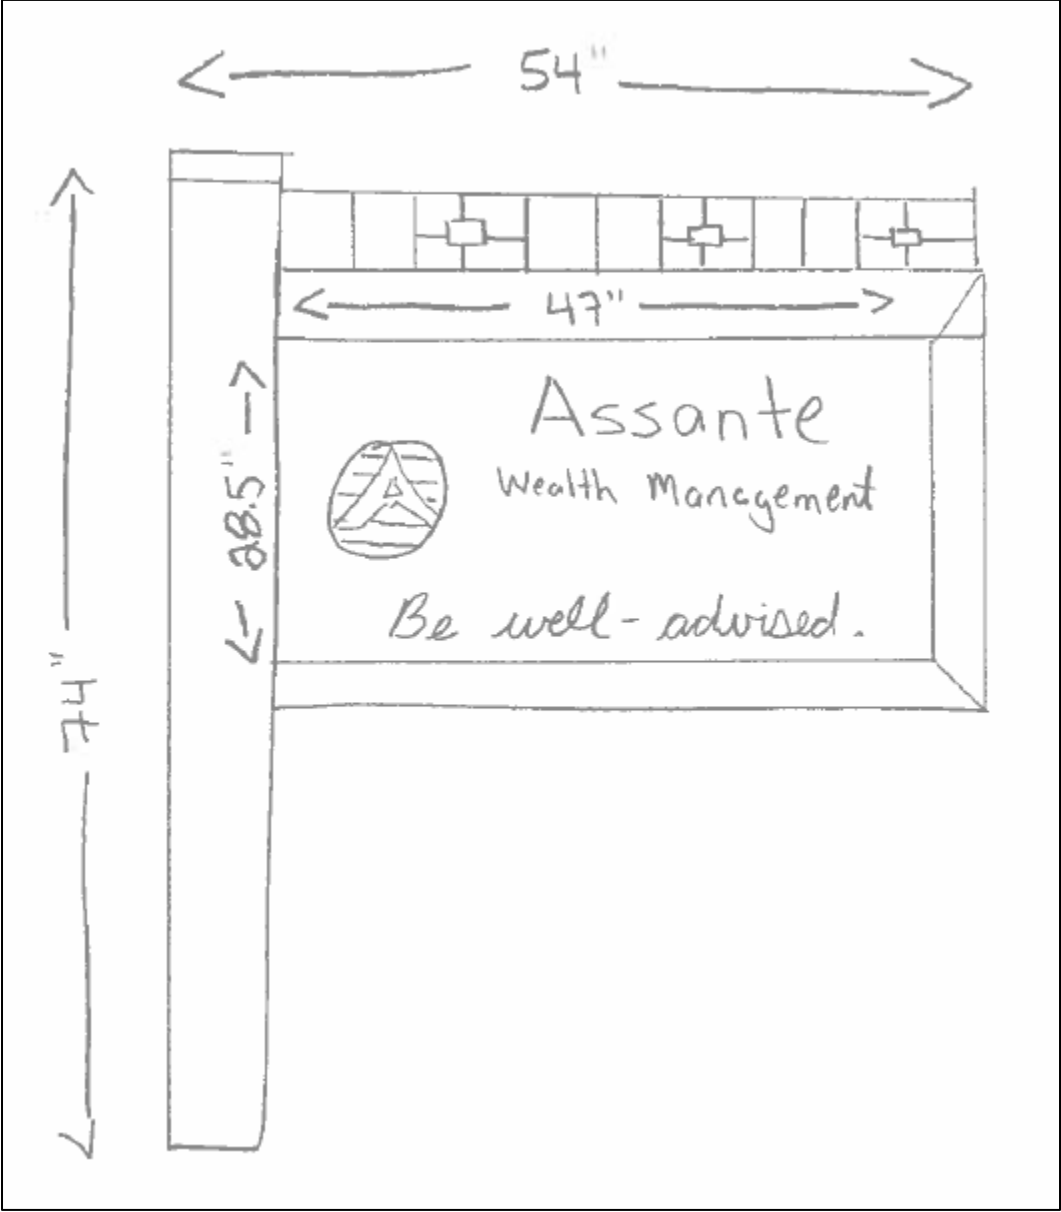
Sketch of existing sign installed at 371 Dufferin Avenue, with measurements, provided by the agent for the property owner.
